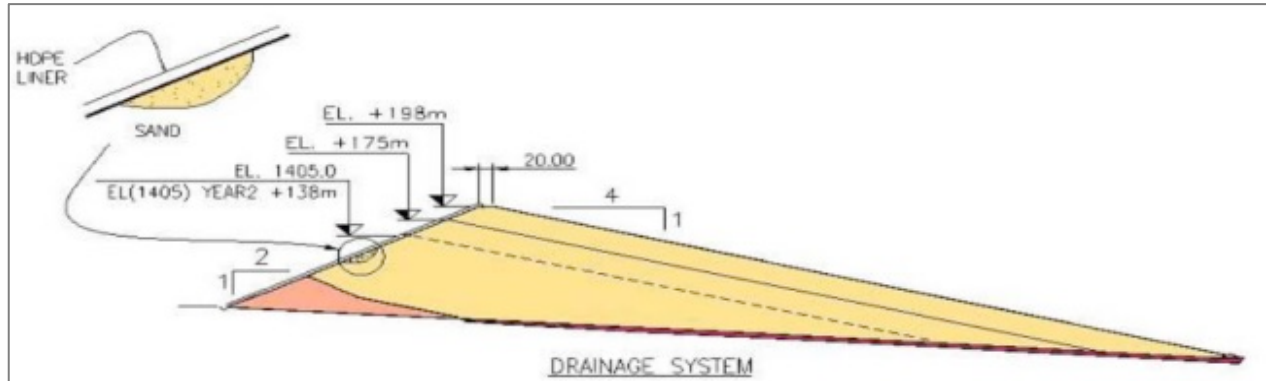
Quillayes tailings dam cross-section with elevations and slope details (Campaña et al., 2015)
